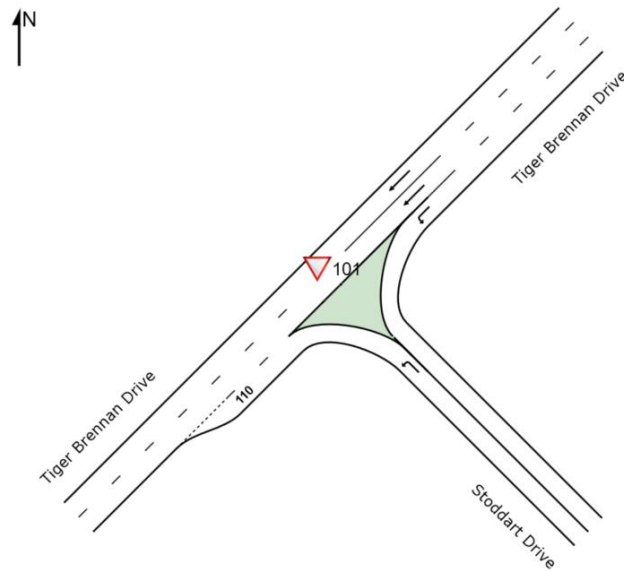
Intersection 2 Modelled SIDRA Layout
